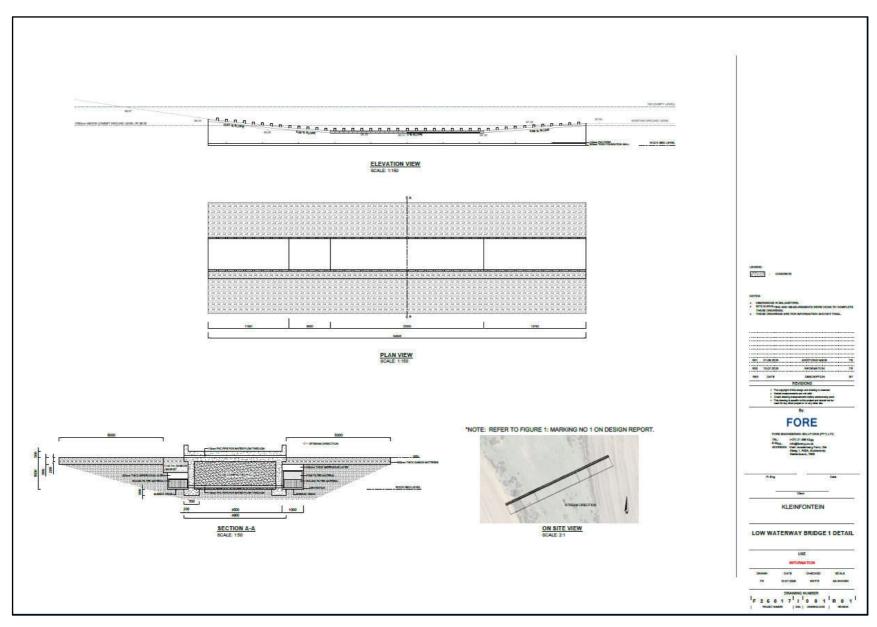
Low waterway stream crossing 1 design detail (Fore Engineering Design report; July 2025)
